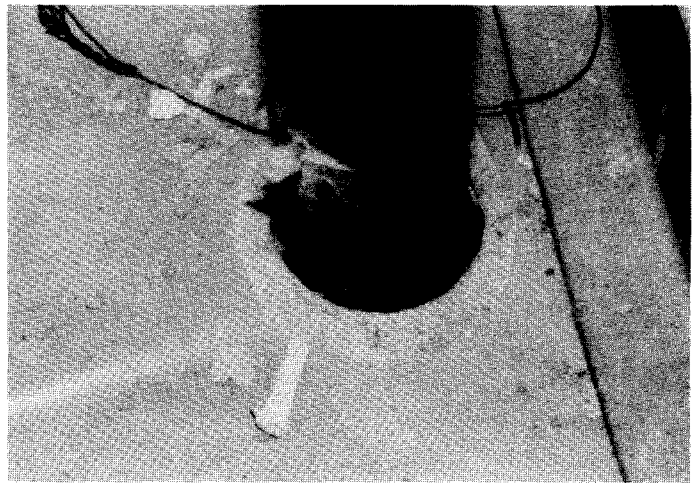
Unsealed polyethylene vapor retarder in a ceiling at a pipe penetration.
